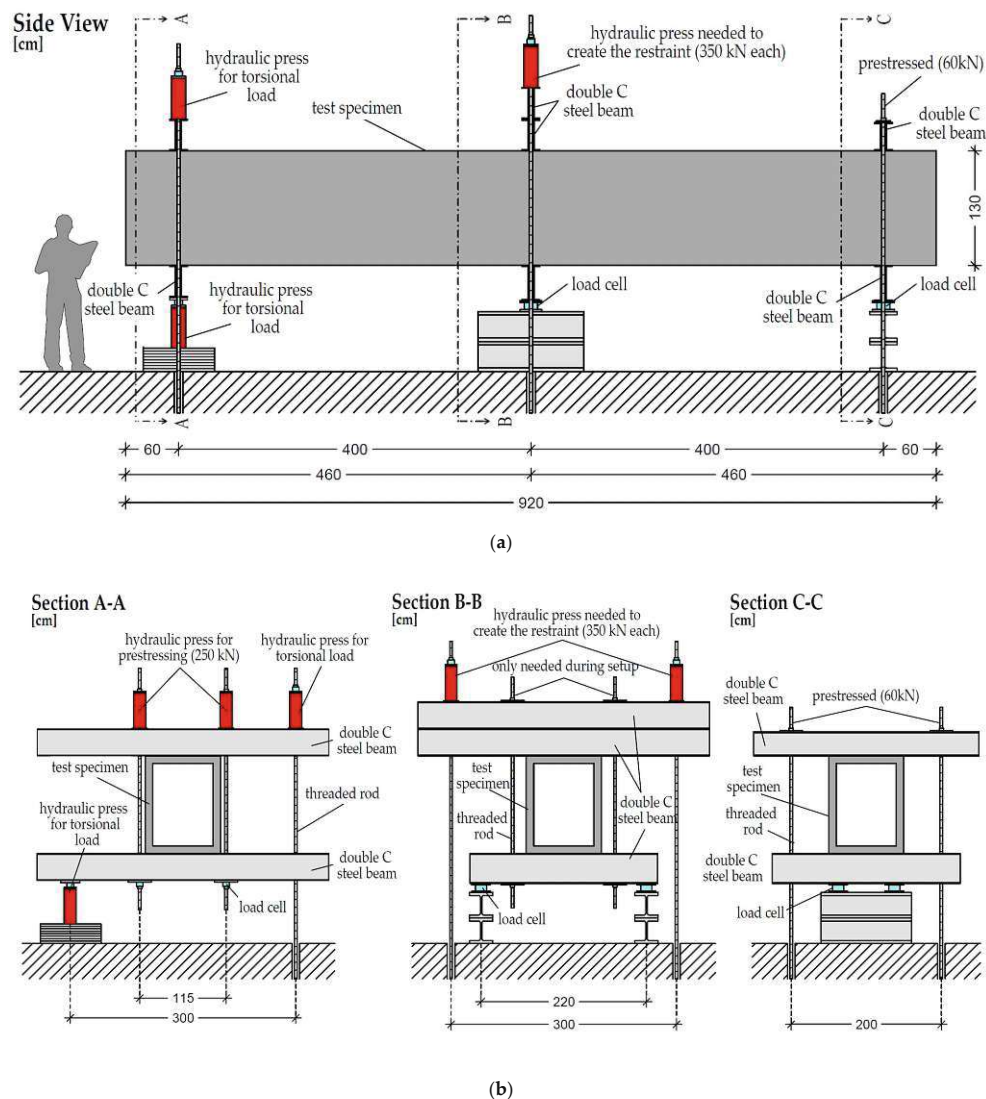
Illustration of the test setup: (a) view of the test body from the side onto the web. (b) Section A–A: torsional load application area; Section B–B: prestressing against the strong floor using hydraulic presses to achieve the restraint; Section C–C: additional restraint to avoid tipping of the specimen.
